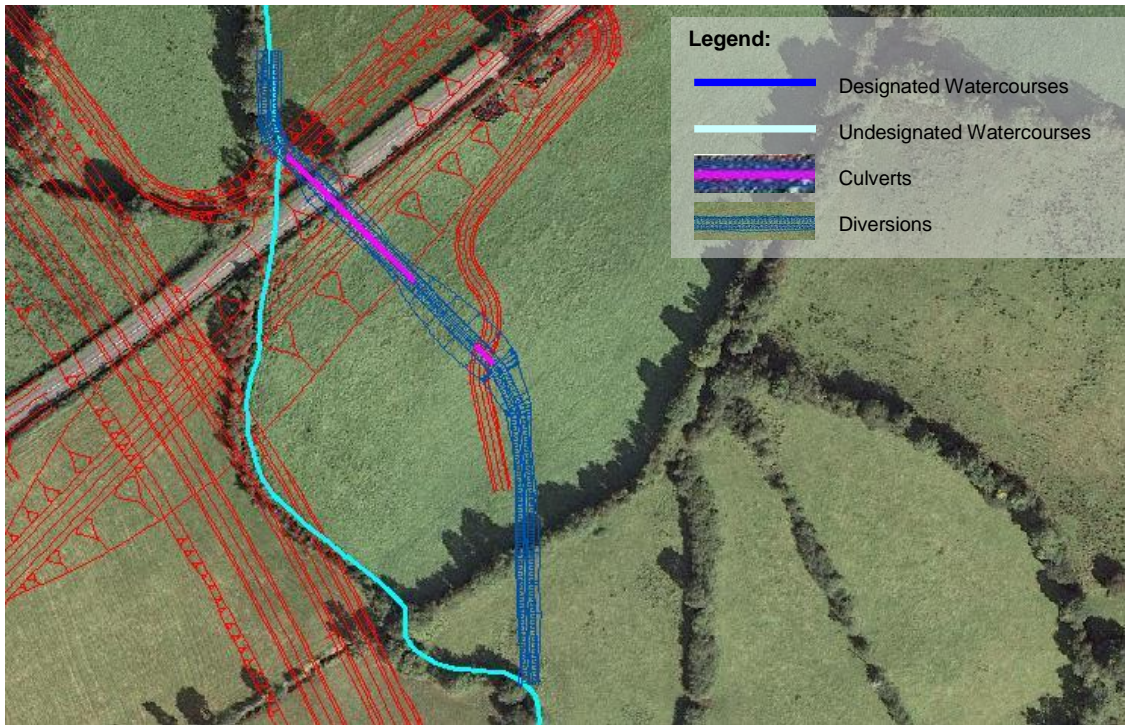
Plan of Undesignated Watercourse Diversion (S3-WD-37) and Culvert Arrangement (S3-PC-88 and S3-PC-45)
